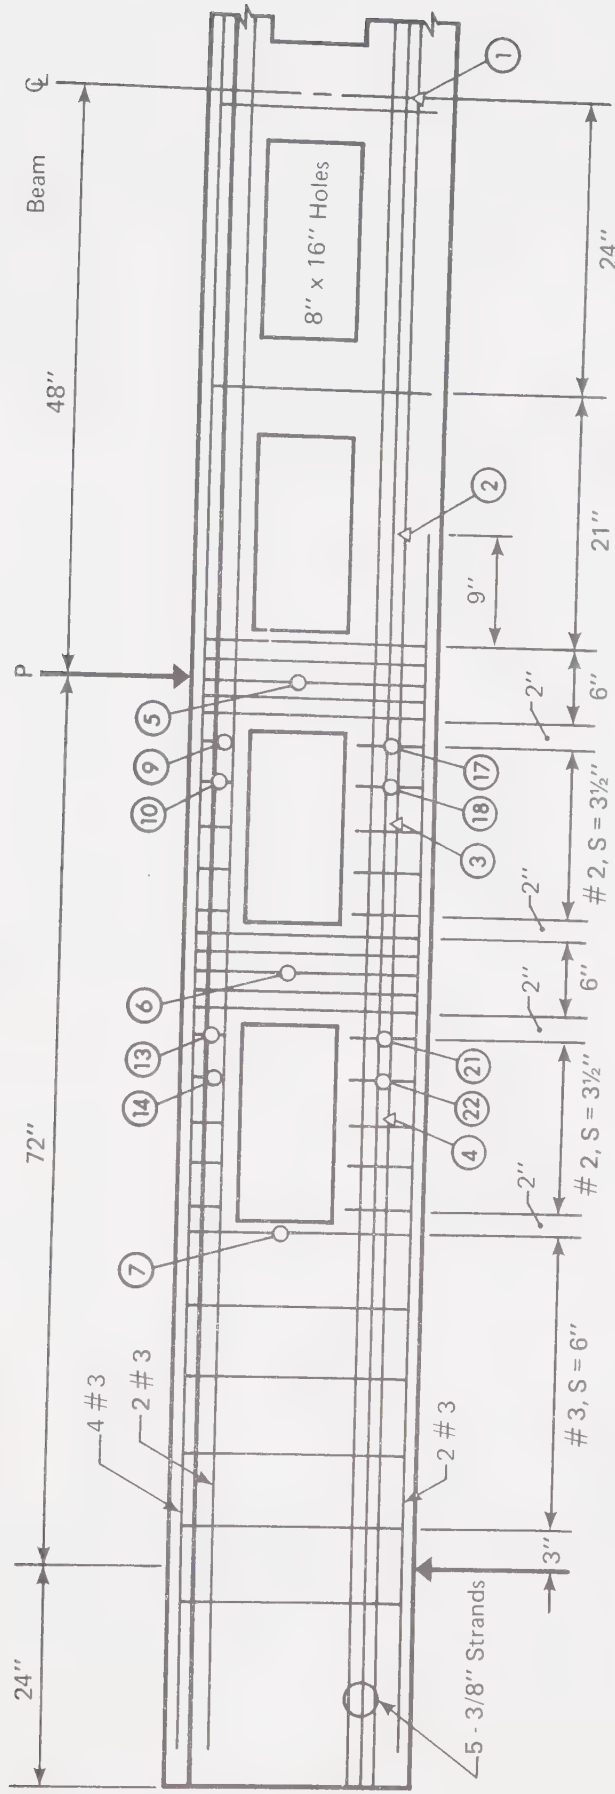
Reinforcement Details and Strain Gage Locations for Beam 7-16-6
